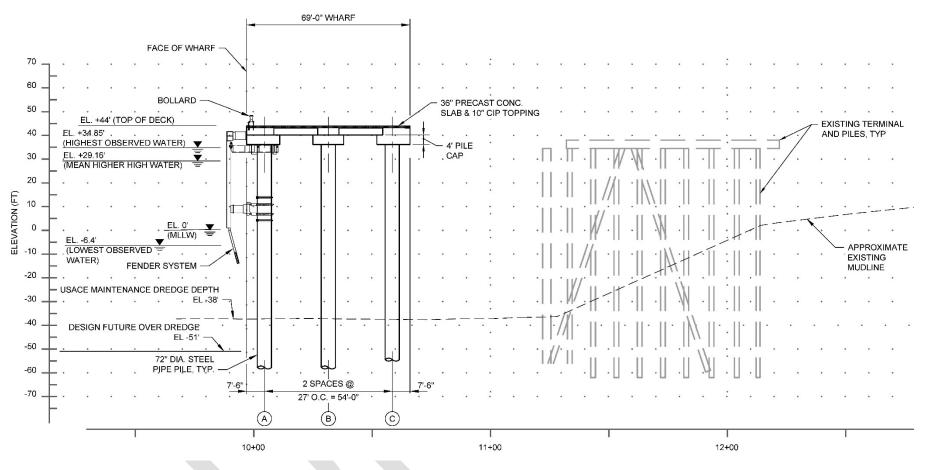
Typical Wharf Section for Terminal 2: Alternative 2A with 72-inch-diameter Driven Piles
